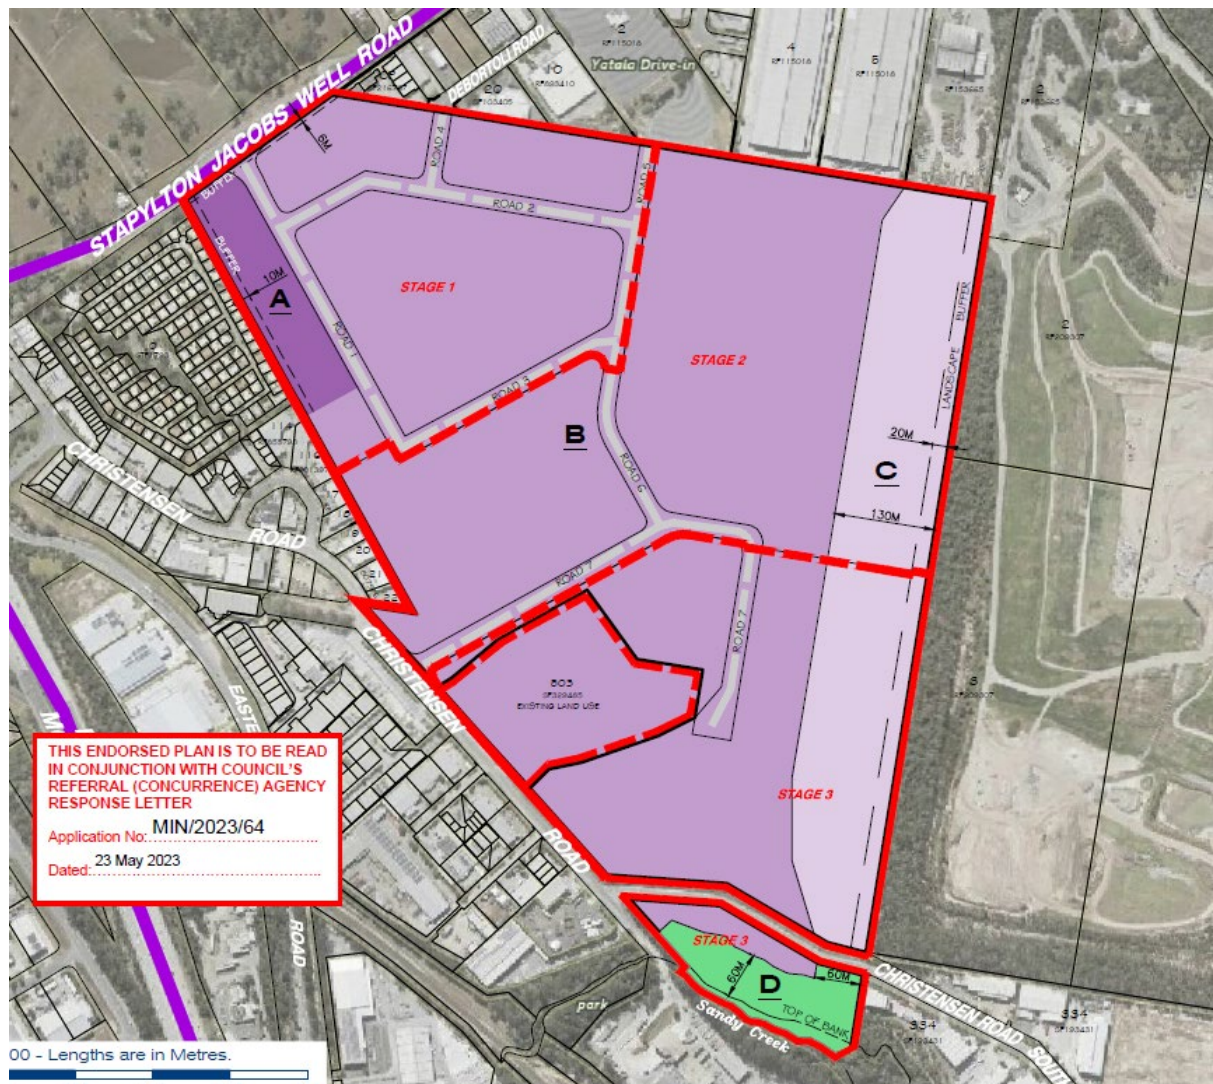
Vantage Industrial Estate Staging Plan and indicative road layout design (Source: MIN/2023/64)
